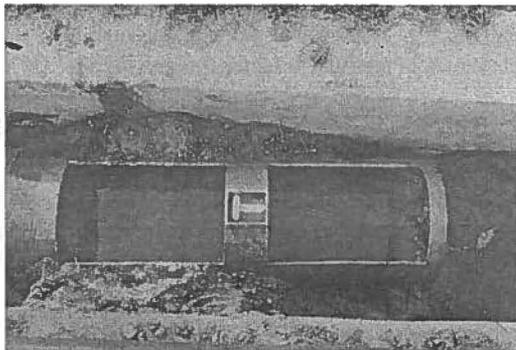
Portable Flume Constructed in a Section of Circular Pipe.
